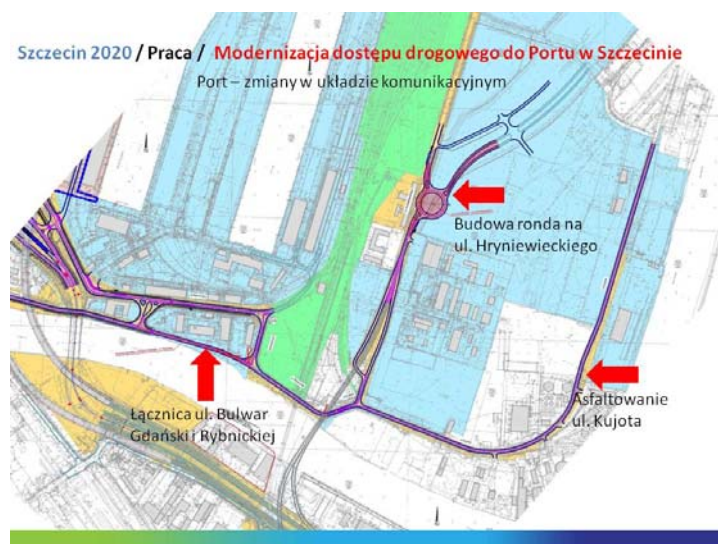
The planned reconstruction of the road system at Łasztownia. Source: [19]
